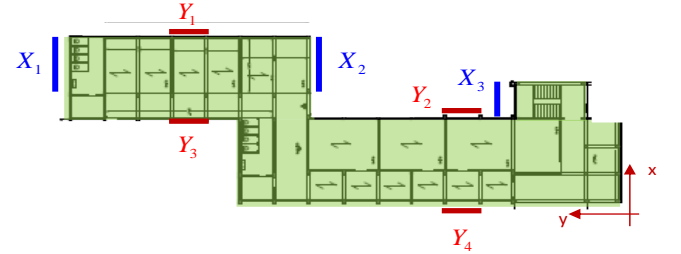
Position of the external dissipative bracings for all the configurations proposed
